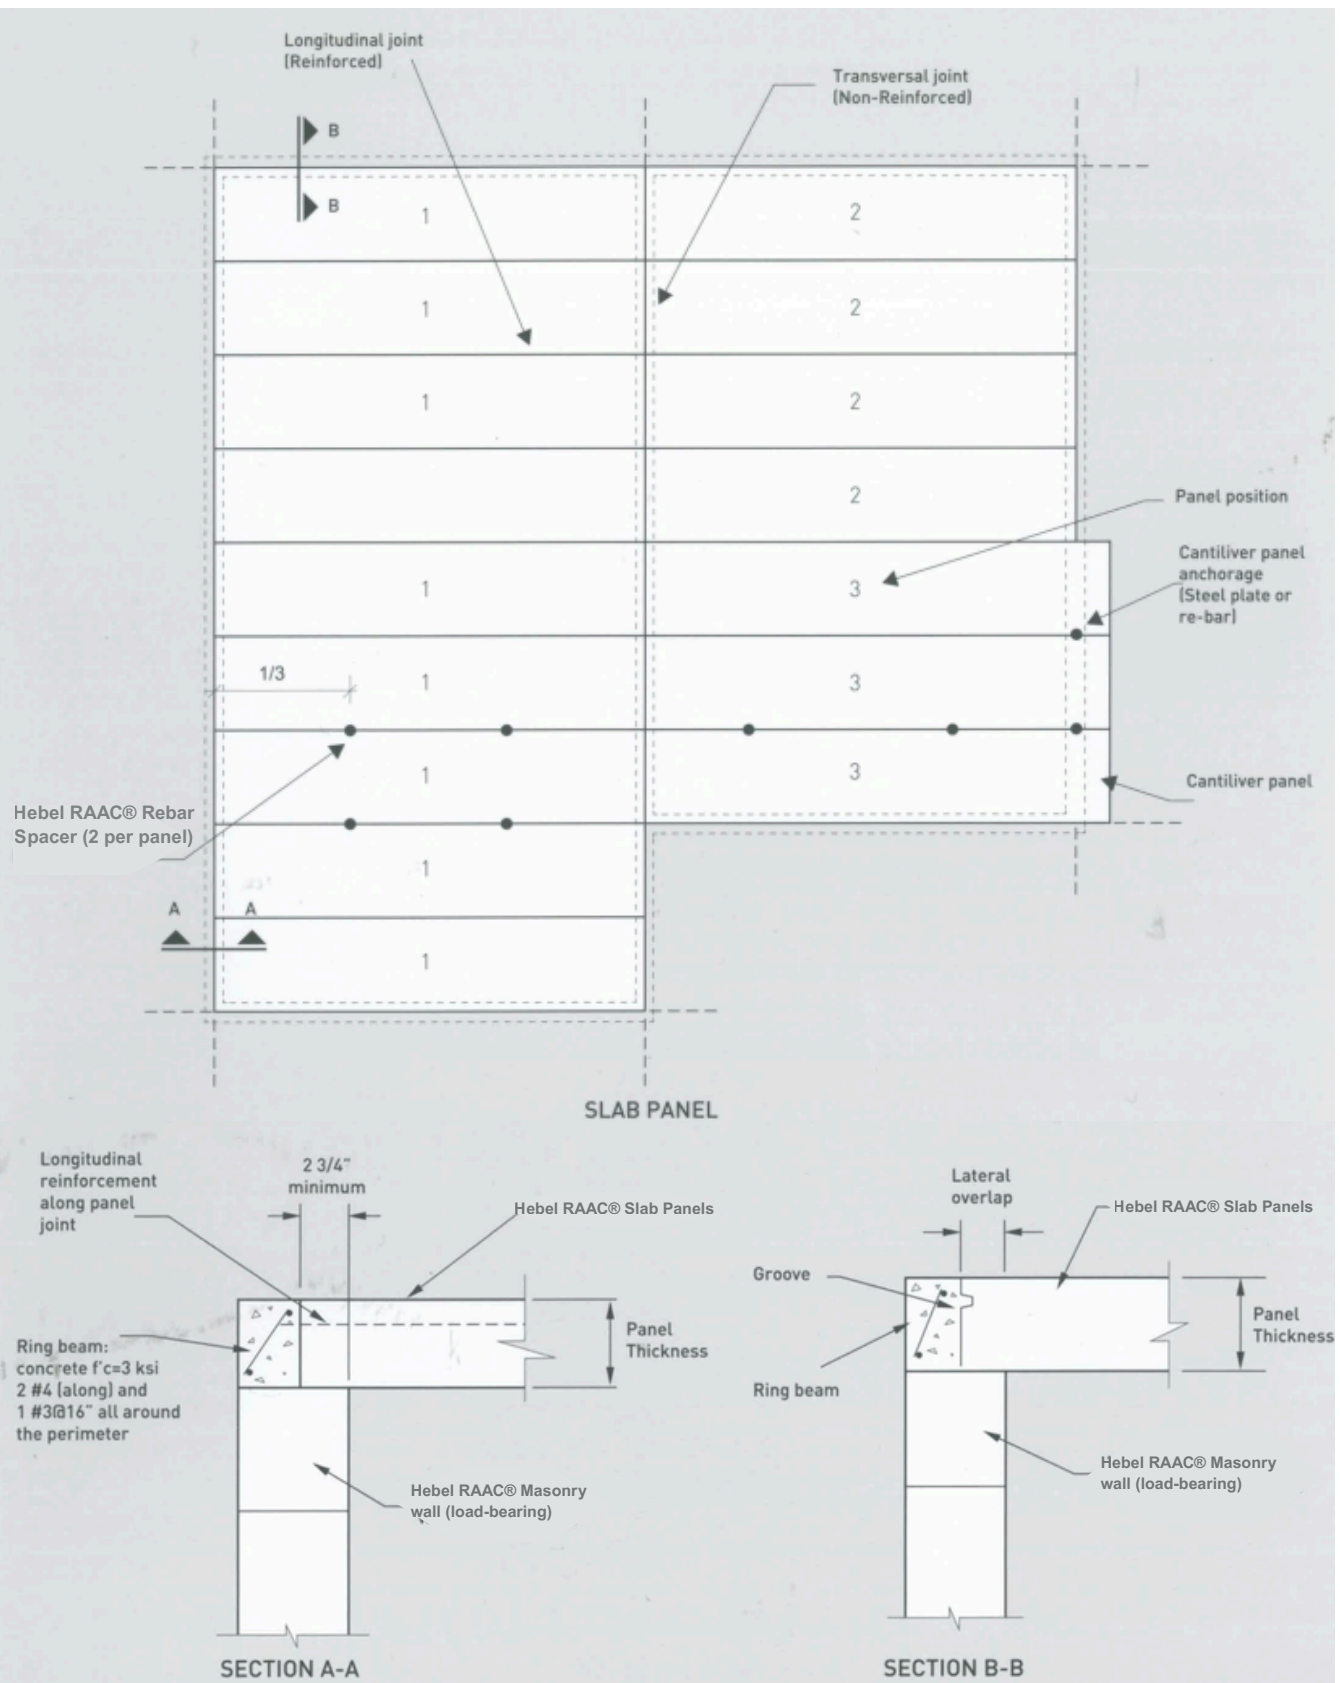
Hebel RAAC® Slab Panels Slab Panels over masonry
